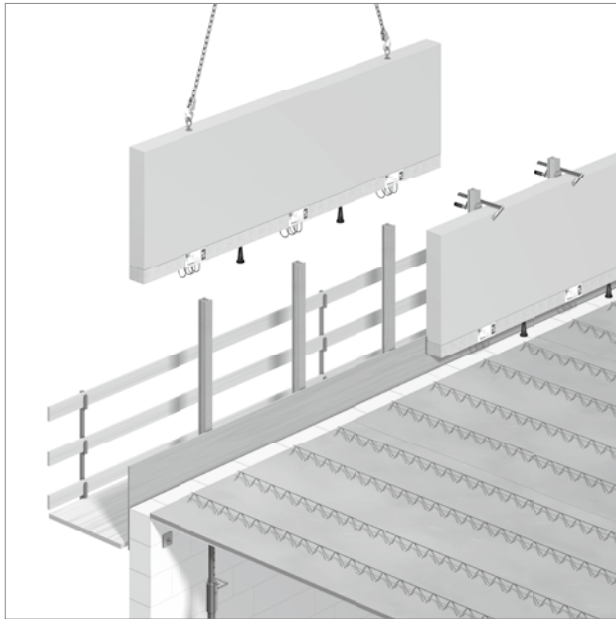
Schöck Isokorb® XT type A with Combar® erection support for precast elements: Hoisting of the prefabricated attic
